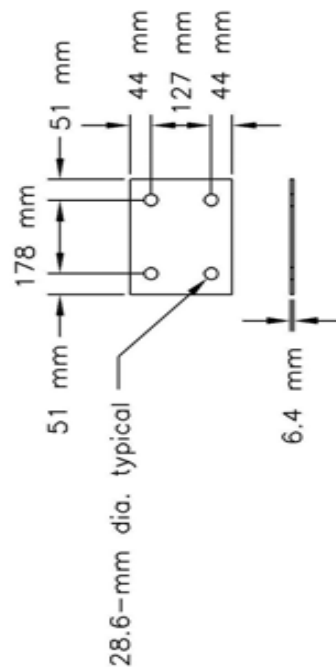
W-Beam Guardrail Attached to a Low-Fill Culvert Post Nos. 18 through 20 and 22 (Option No. 2)
